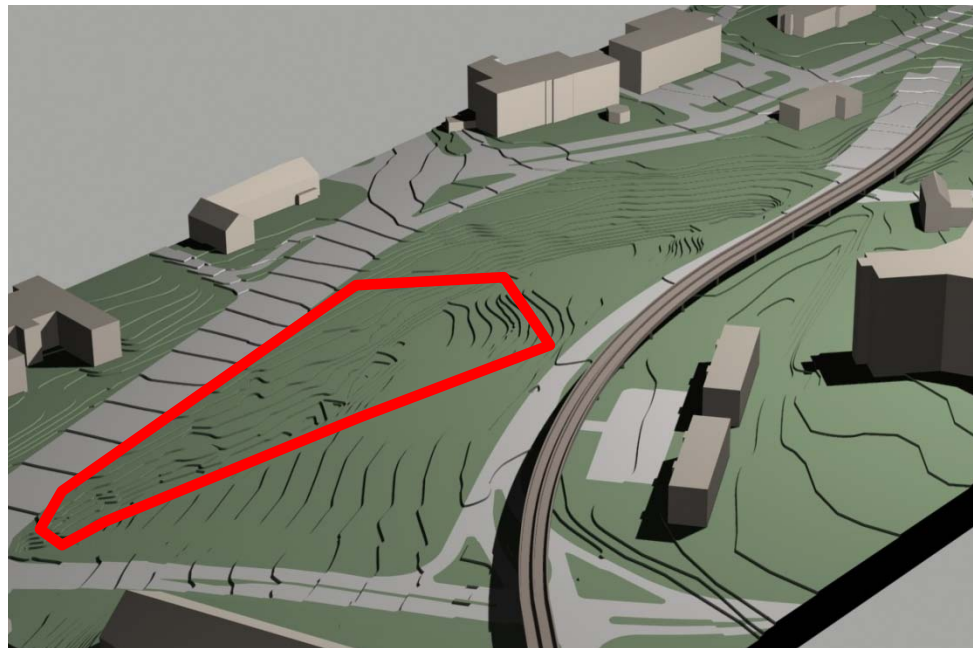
Site Layout Prior to Construction - Storm Retention Area Outlined in Red
